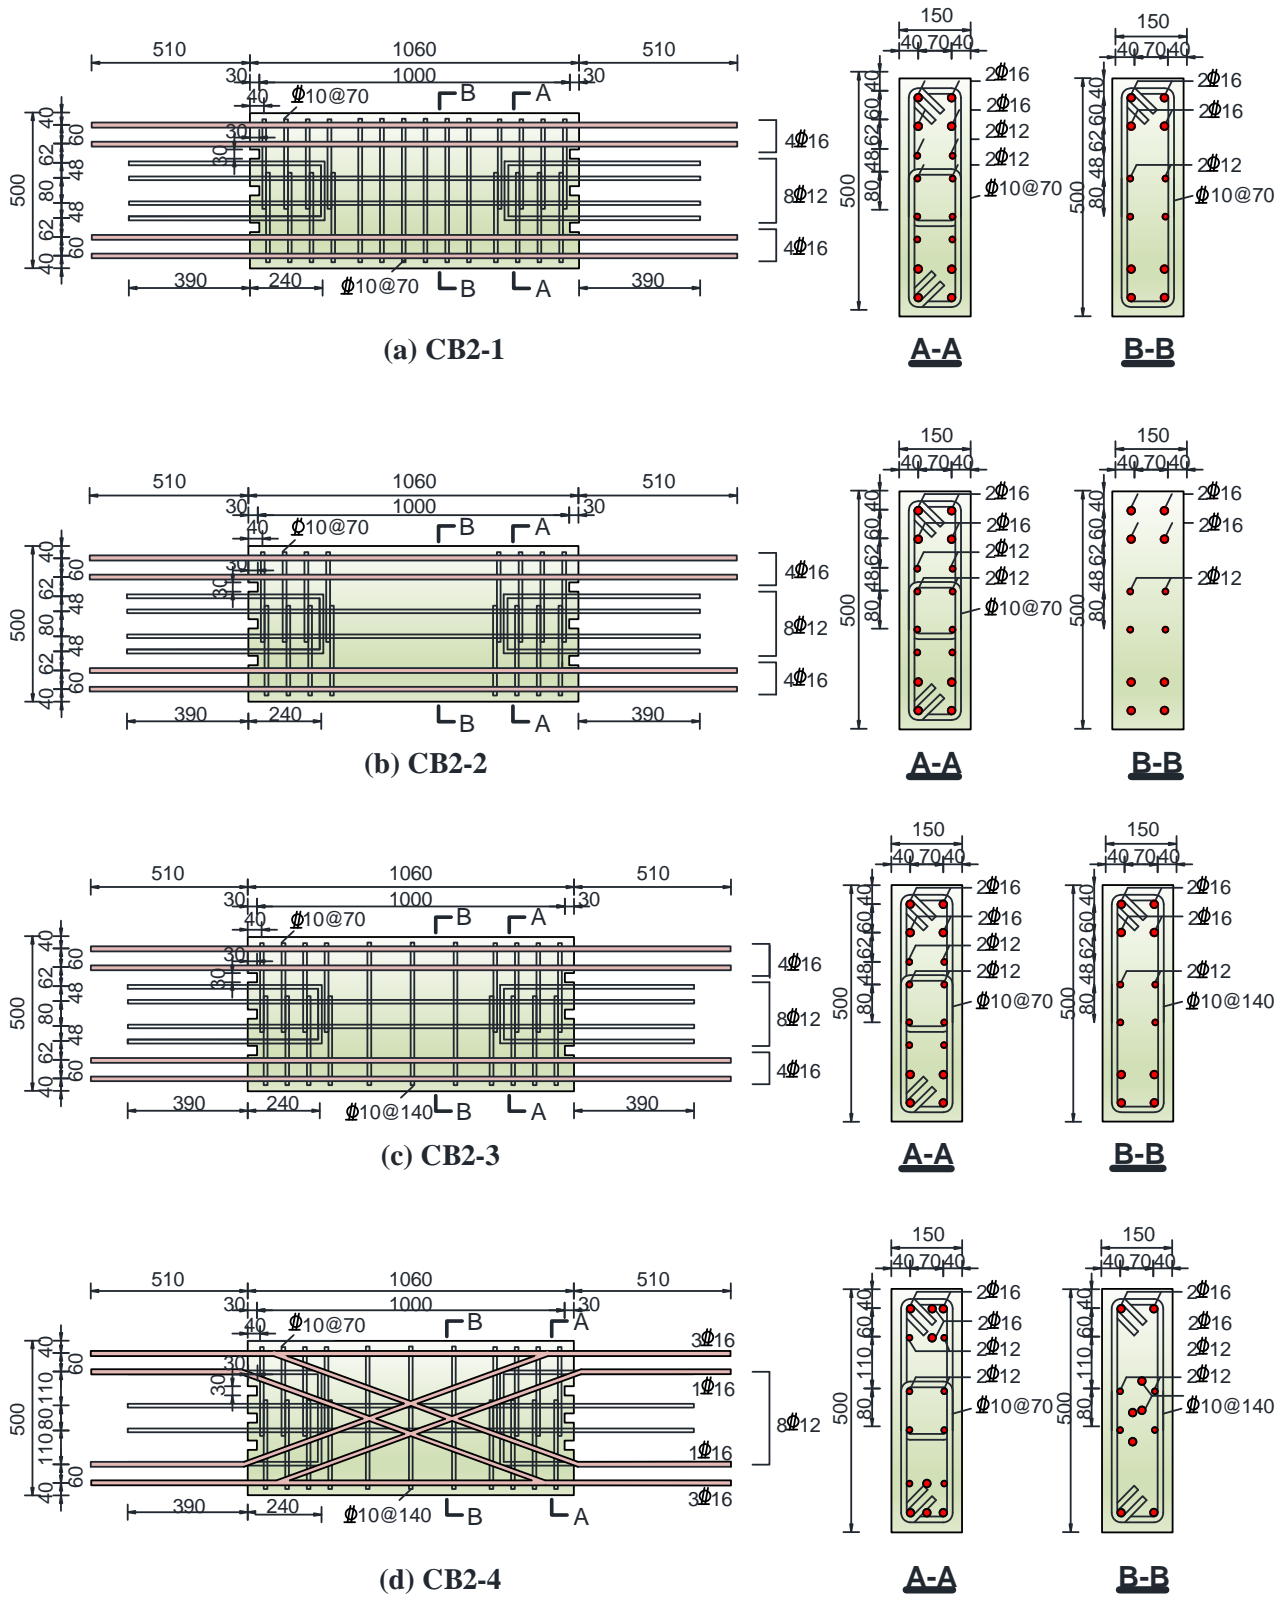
Dimensions and reinforcement details of (a) CB2-1 (b) CB2-2 (c) CB2-3 and (d) CB2-4
